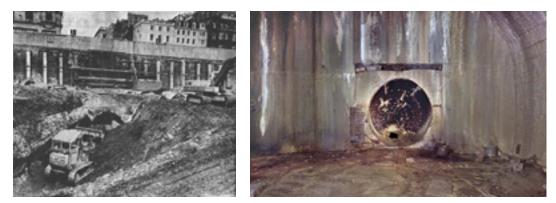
(left) Southern end of the tunnel demolished during excavations for the Princes Mall foundations. [Edinburgh Evening News 05/01/1983]
